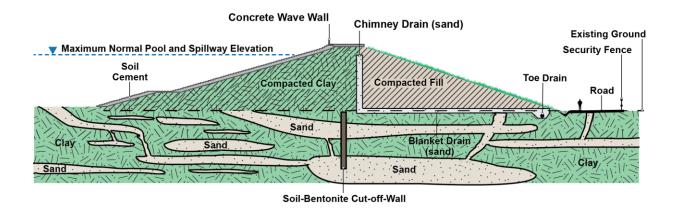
Reservoir Embankment Section showing Wave Wall and Chimney Drain
